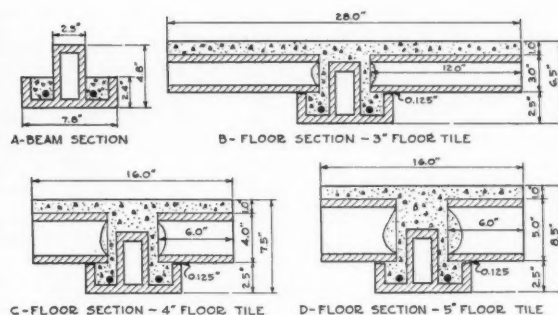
DETAILS OF BEAM AND FLOOR SECTIONS USED IN TESTS
